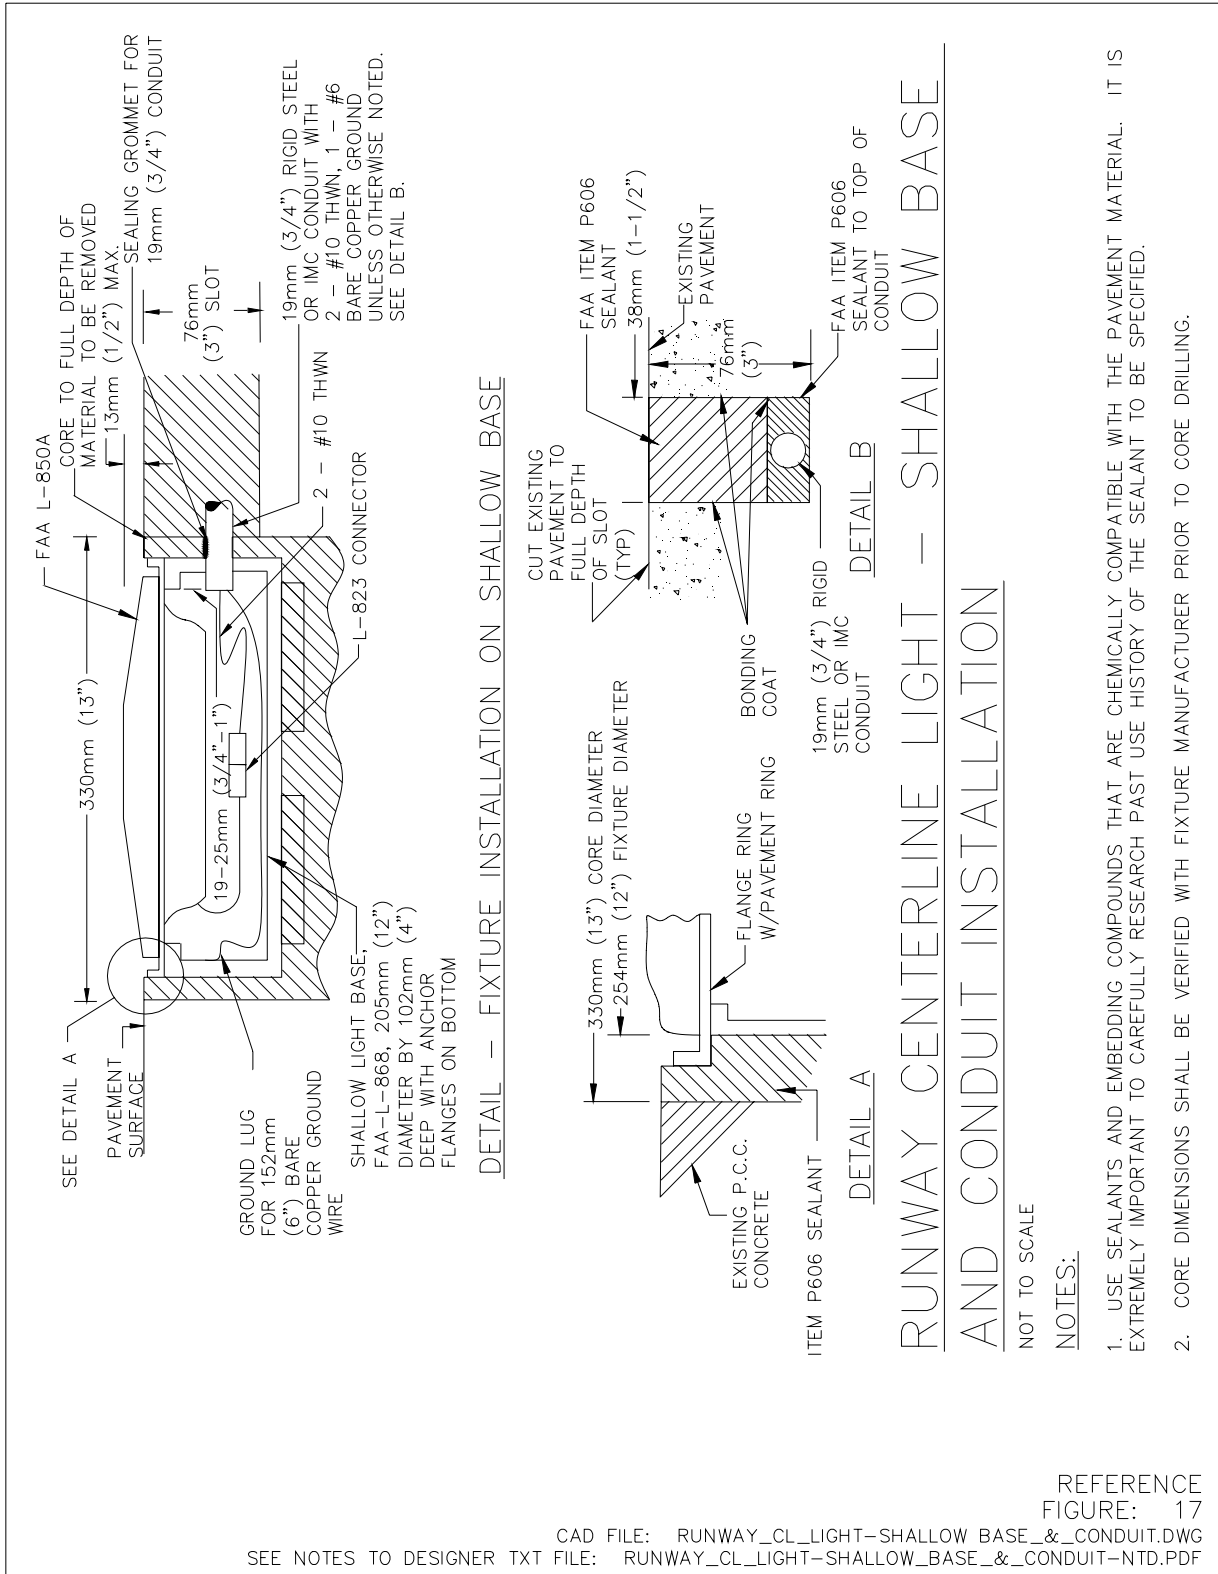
Runway Centerline Light – Shallow Base and Conduit Installation
